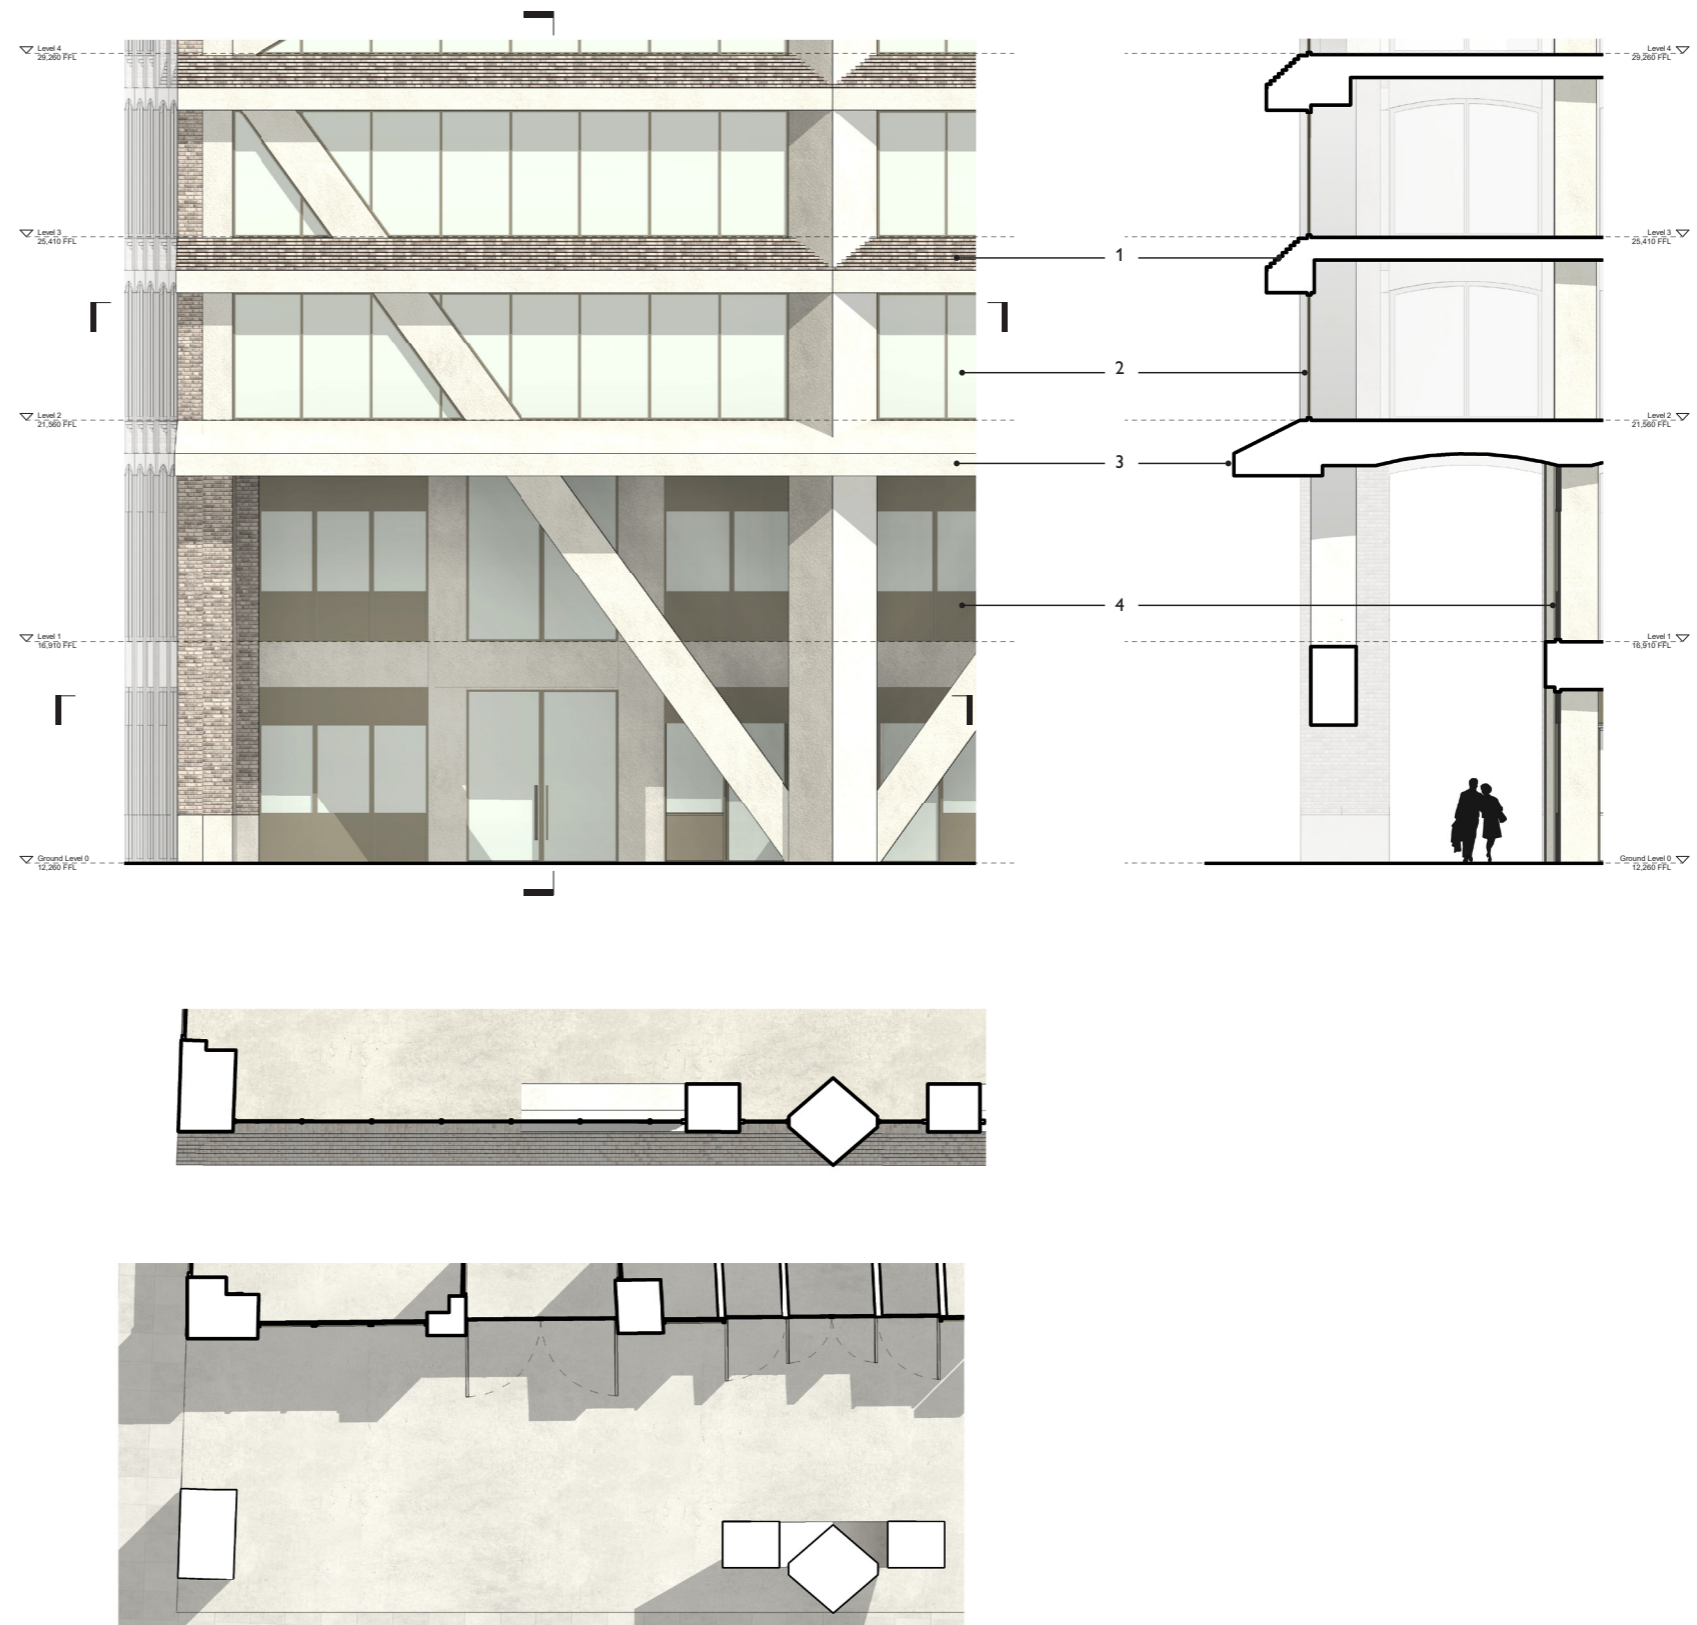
West Façade - typical plan, section & elevation - bottom & middle
